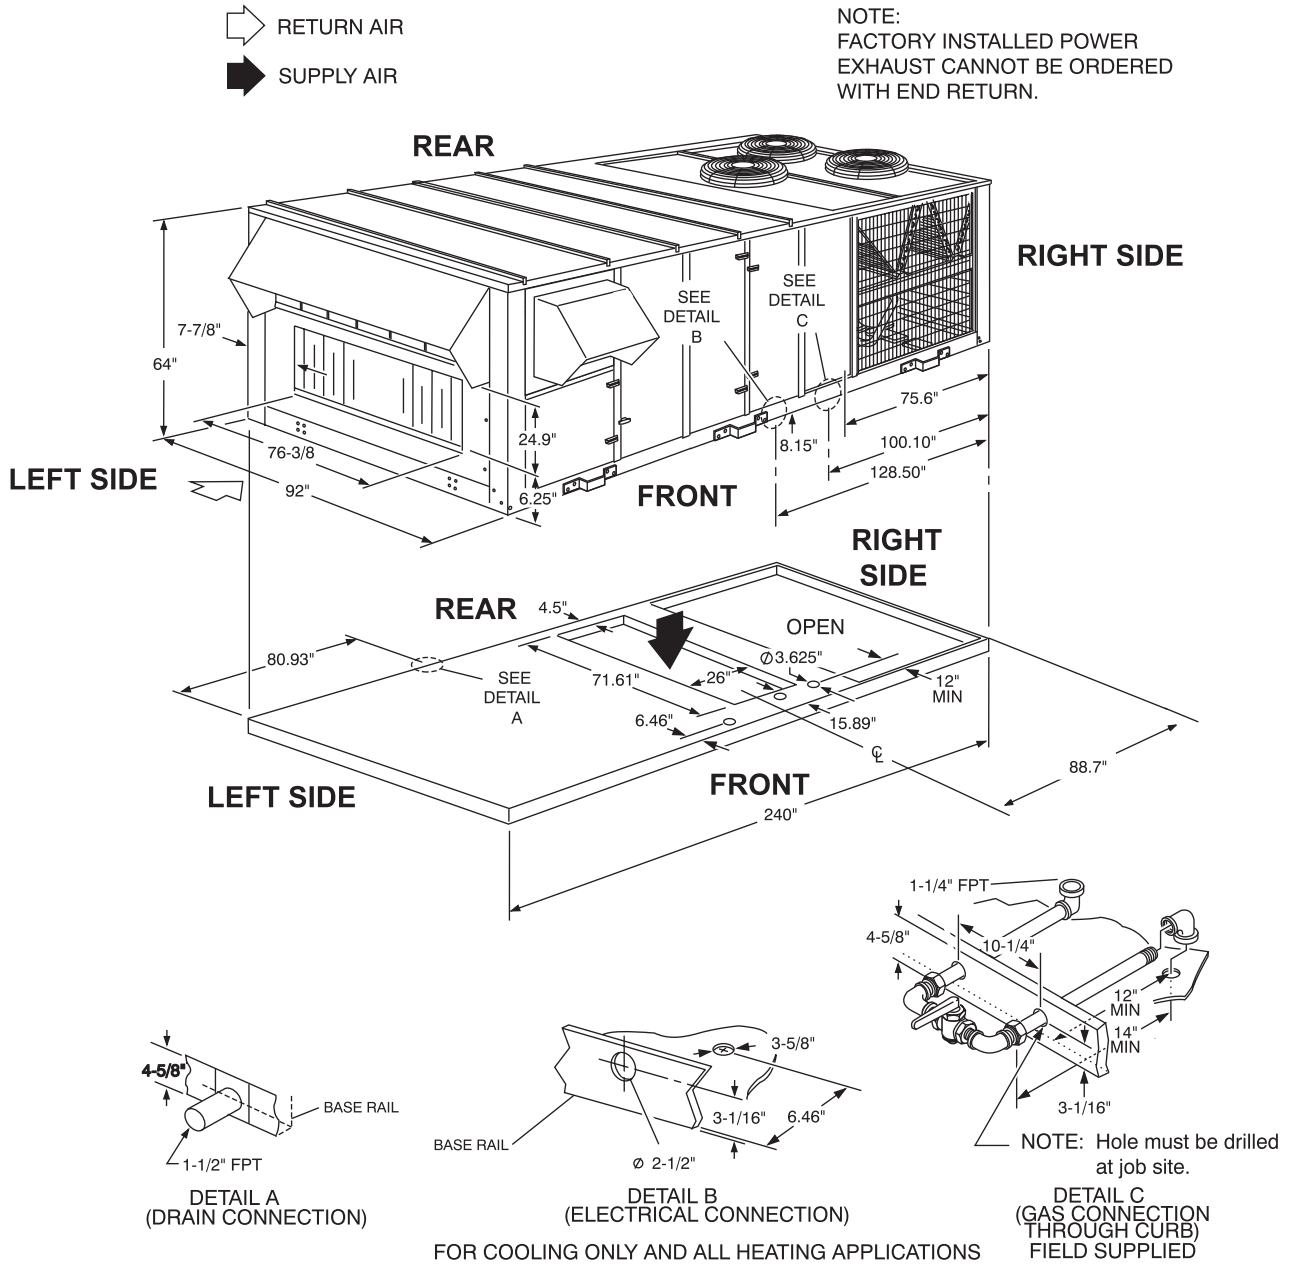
END RETURN, BOTTOM SUPPLY
